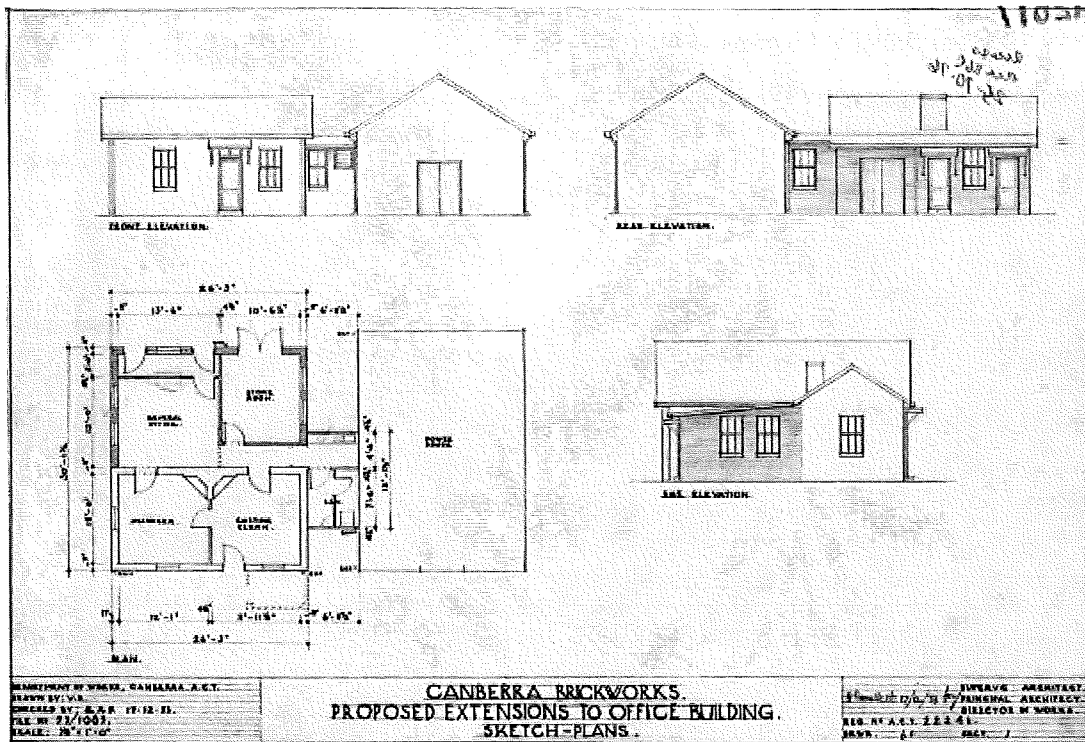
Office extension, consisting of a two roomed addition to the south and a lavatory/washroom infilling the space between the original structure and the Power House, 1953.
